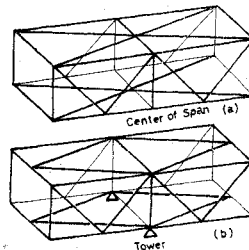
Changing of Lateral Bracing at Center of Span and Towers
